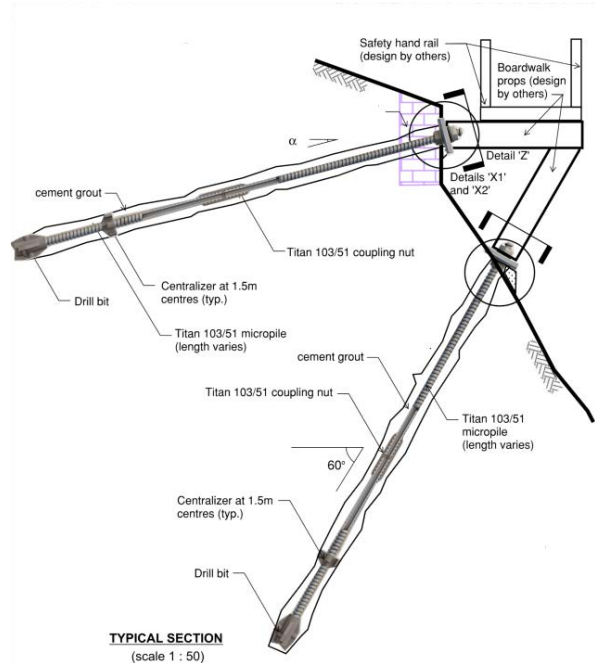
Typical rock fixed boardwalk / staircase structure detail
